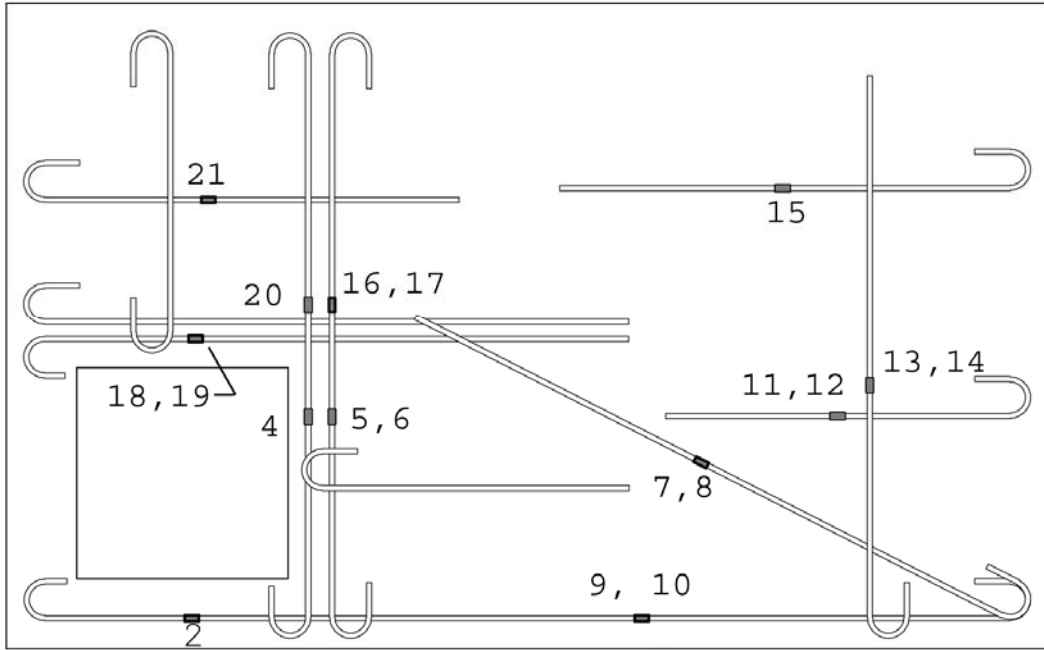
Reinforcement layout of RC specimen. Numbers indicate strain gage number
